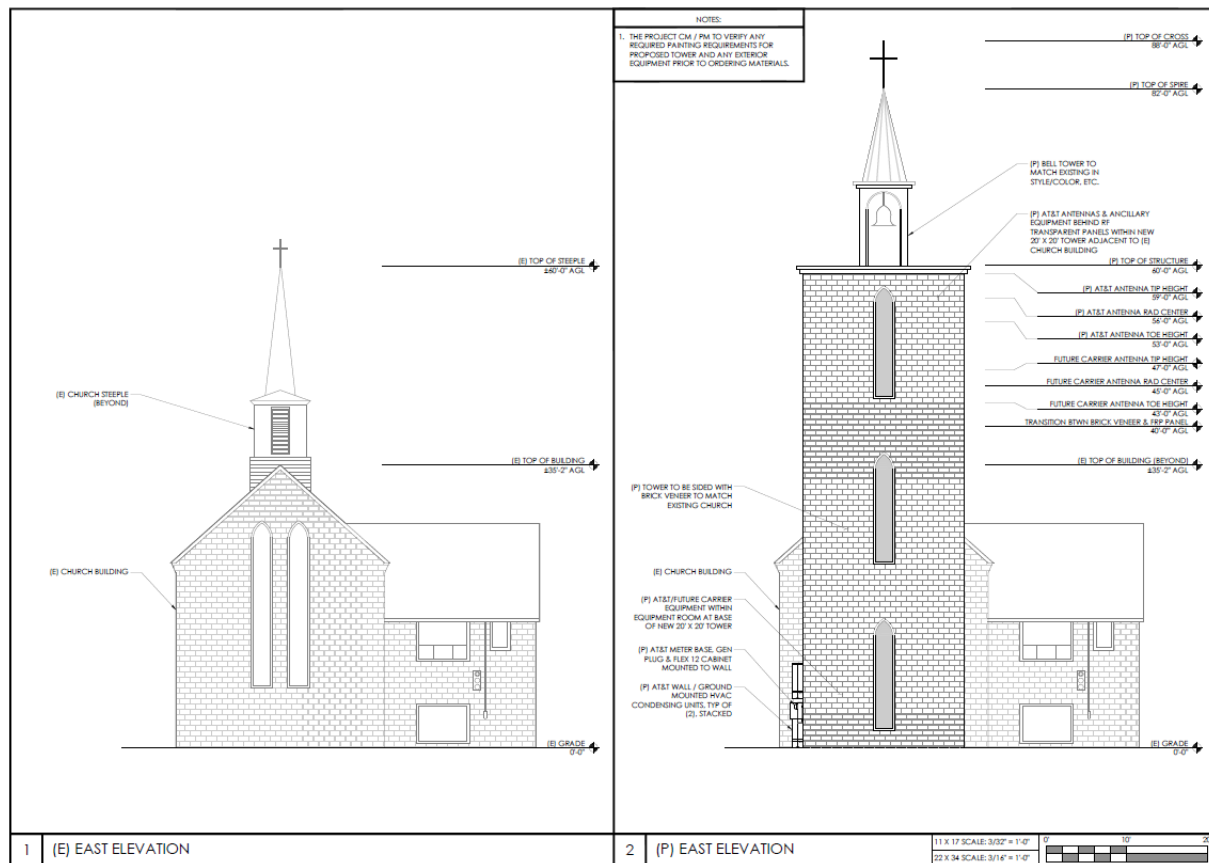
The Proposed New Tower Masked as a Church Bell Tower
